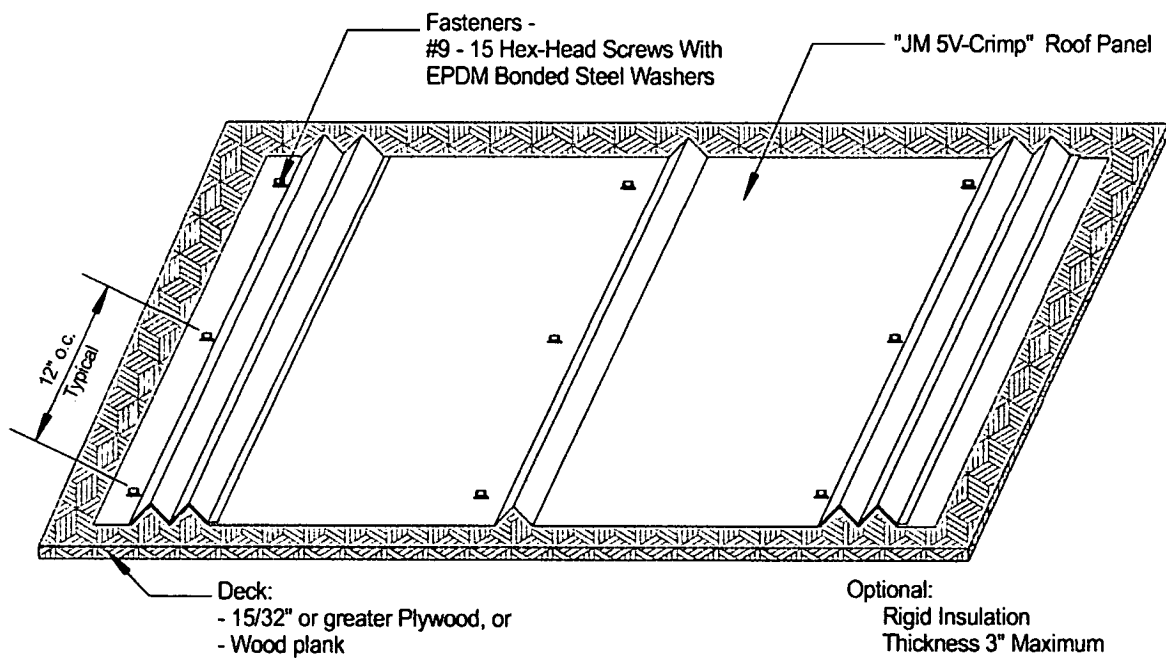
B - Typical Assembly Isometric View (METHOD 2)
